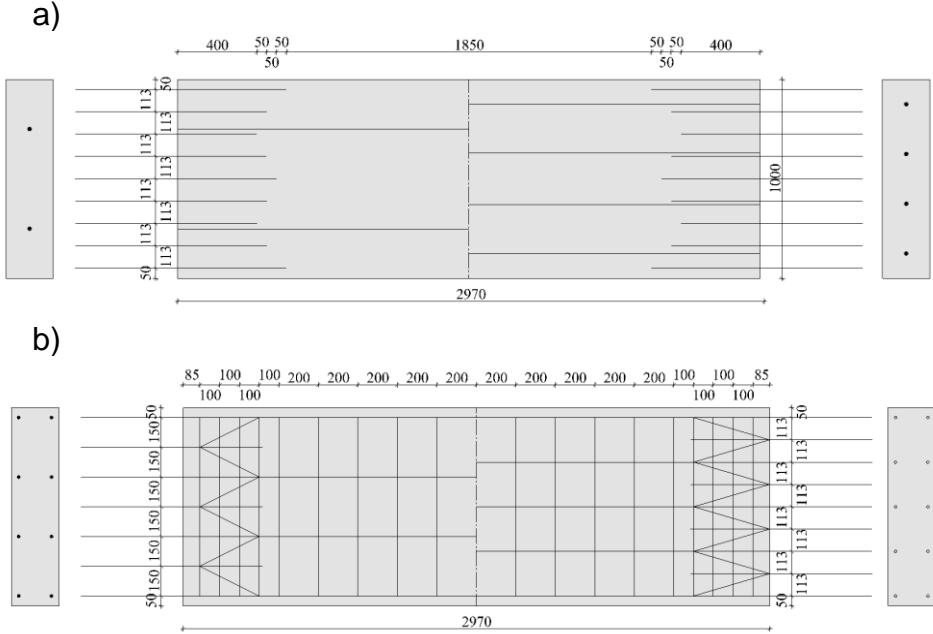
Schematic view of the reinforced slab elements with a) single layer reinforcement and b) double layer reinforcement
